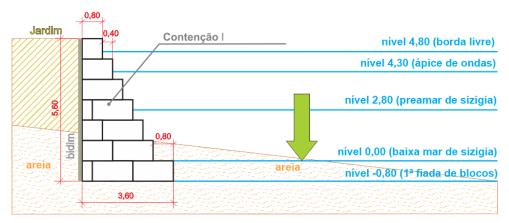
Transverse profile of the maritime retaining wall in BetonBloc, Ipojuca/PE. Source: Authors (2023).
